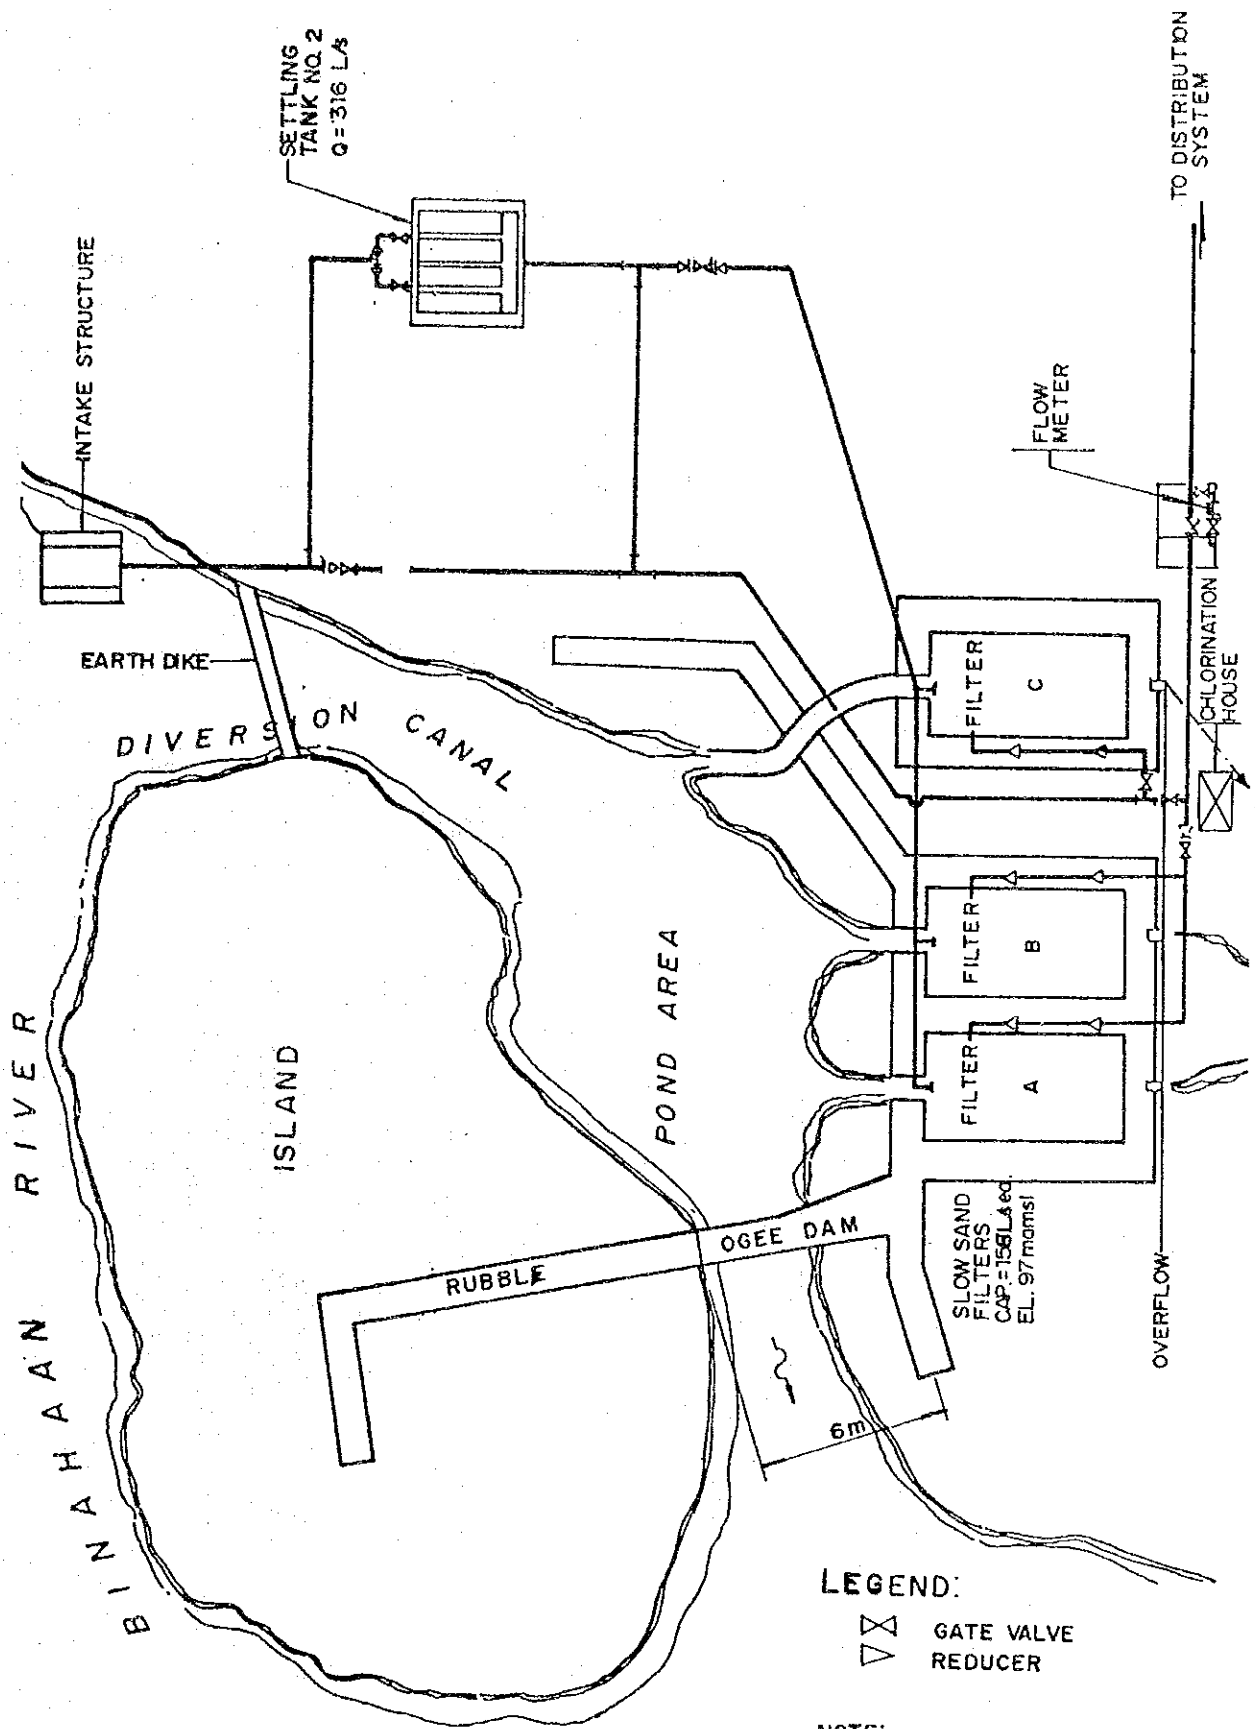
Layout Plan of Existing Tingib Treatment Plant
